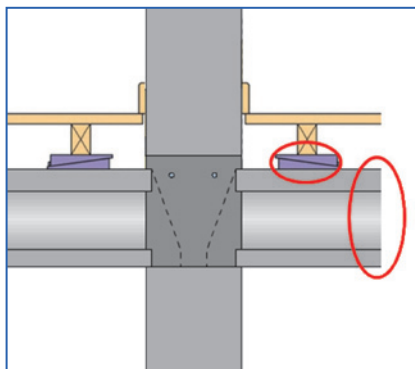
An example of a typical design error in heavy built apartment houses (insufficient impact noise reduction in joist floor construction and insufficient surface mass of the hollow core elements).
